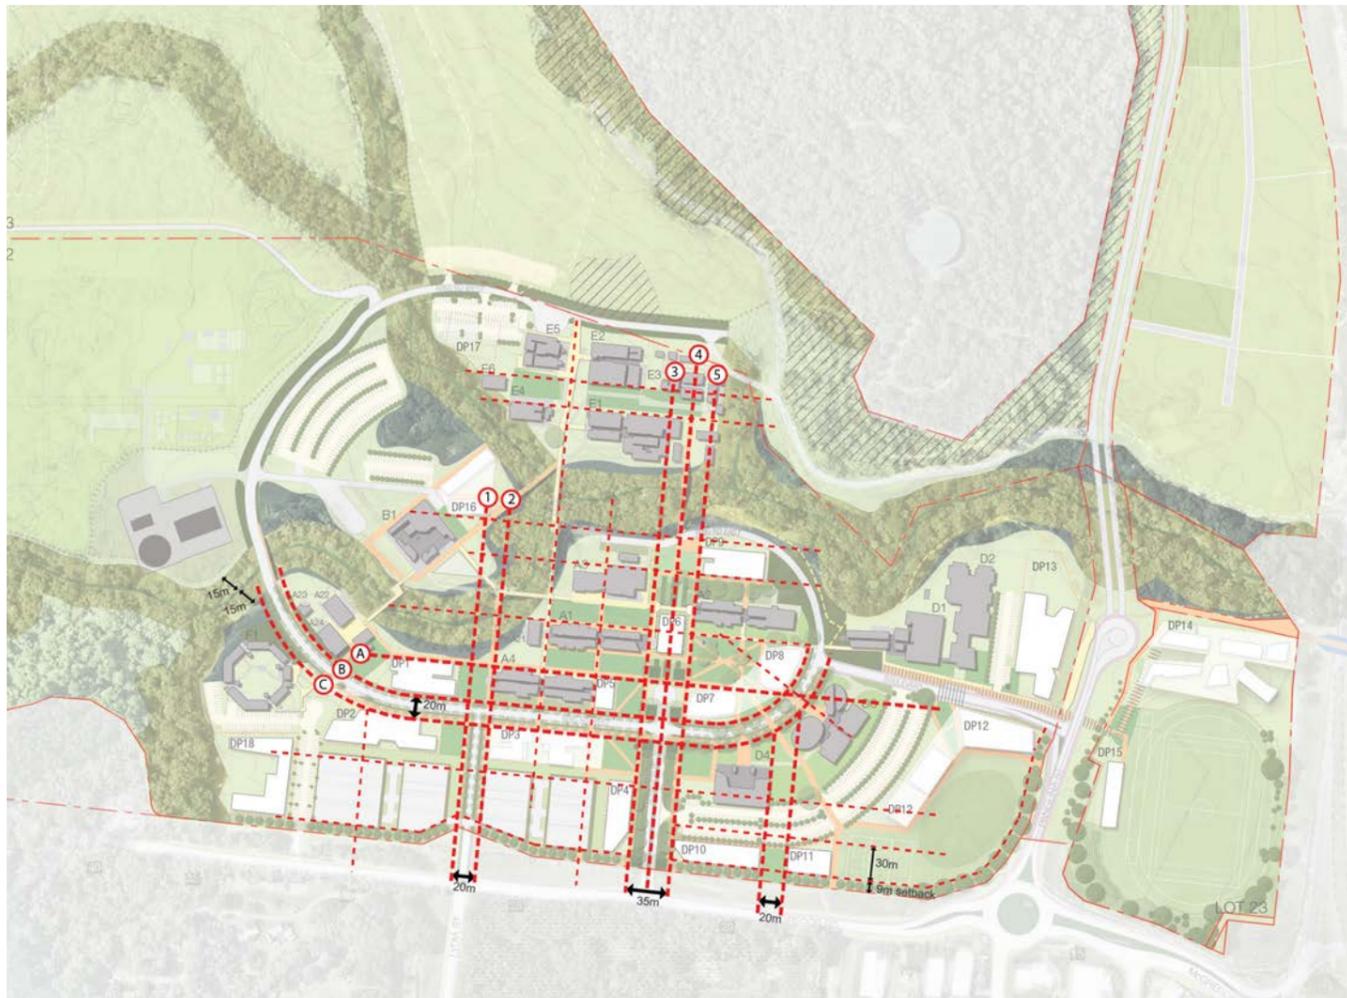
REINFORCE EXISTING BUILDING ORDER
